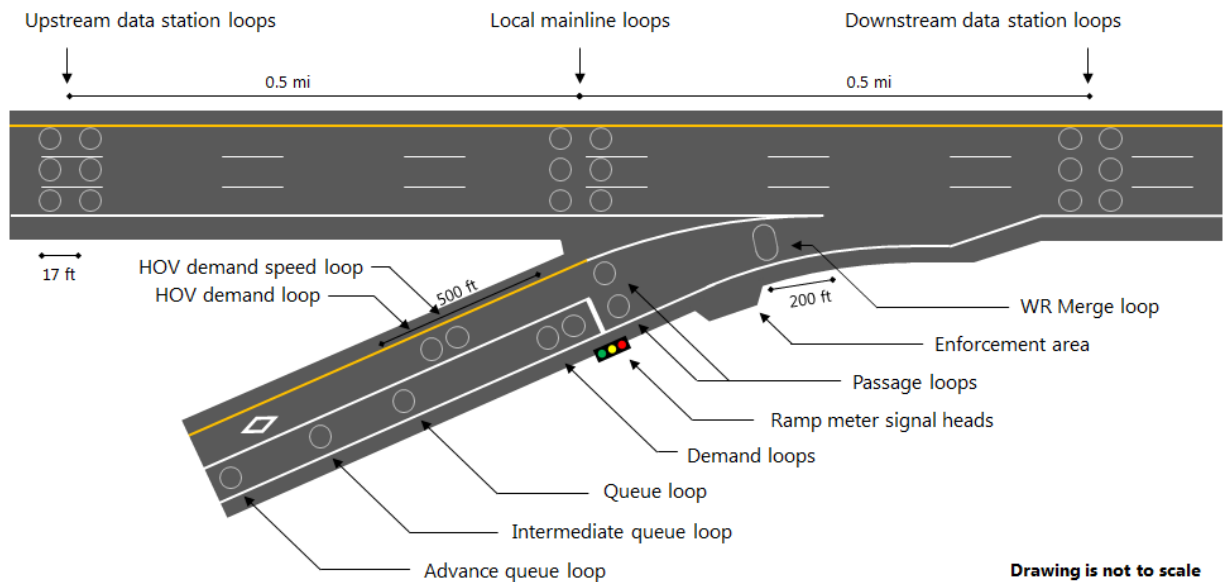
Typical ramp meter layout without HOV ramp metering
